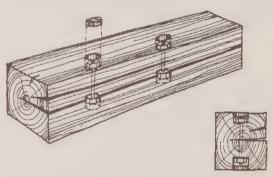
Countersunk bolts and screws present considerable resistance to splitting. Large washers and metal plates can be used in conjunction with the bolts if required.
